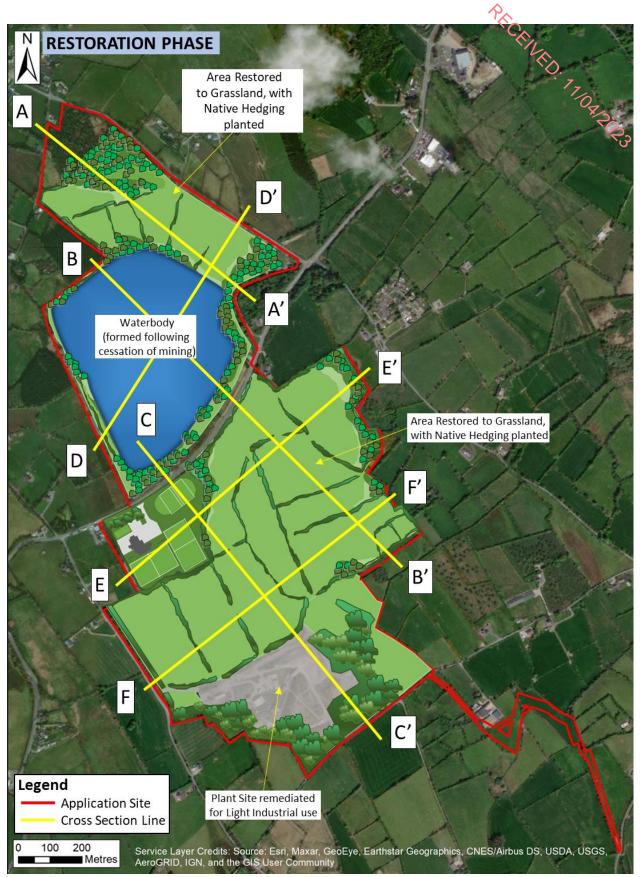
Final Restoration Plan - Knocknacran West and Knocknacran - Phase 7 (inc. cross section lines)
